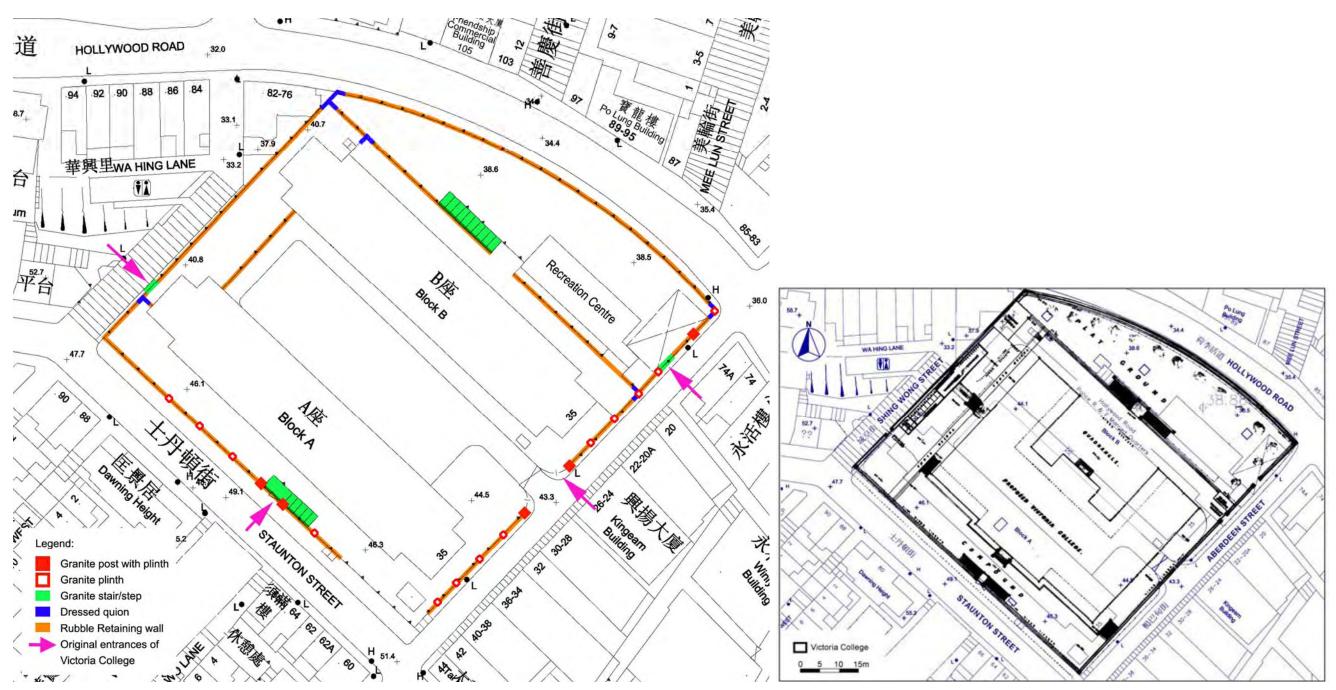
Location plan showing the retained above ground architectural remains of the former Central School (left) and the 1883 layout plan of the former Central School overlapping on the current site (right)
